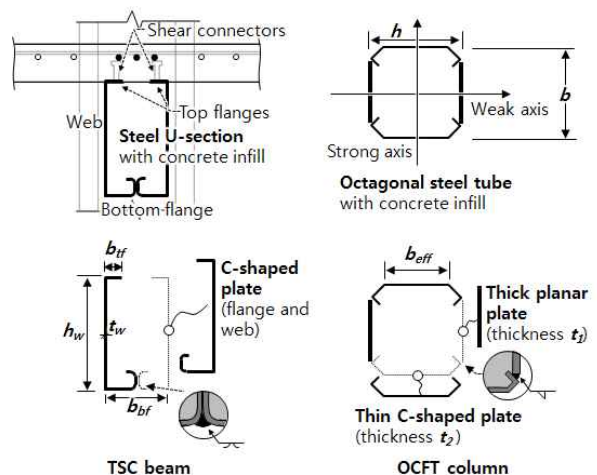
Concrete-filled composite members: TSC beam and OCFT column
